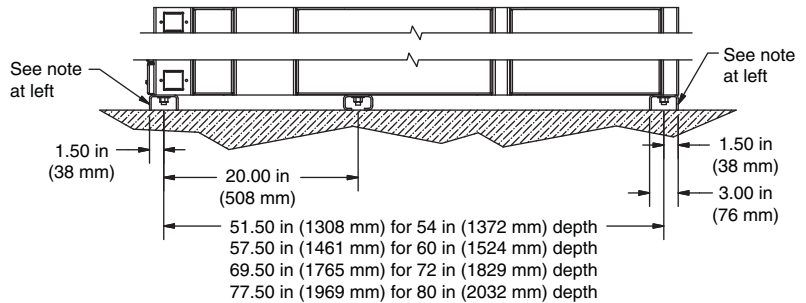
Typical Floor Plan (Side View)—Non-Seismic
